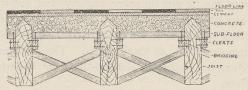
TILES LAID IN CONCRETE AND SUB-FLOOR.
